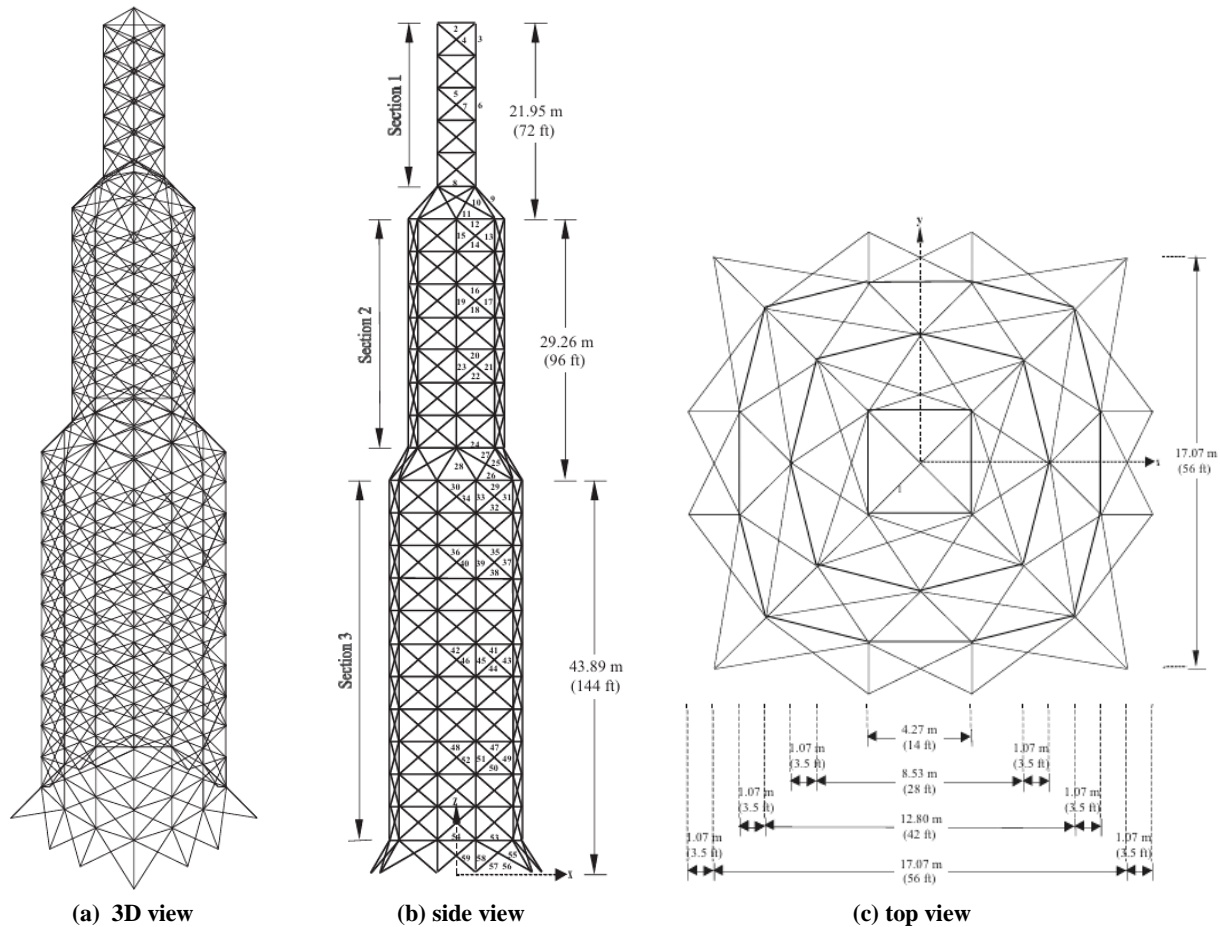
Schematic of the 942-bar tower truss, (a) 3D view, (b) side view, and (c) top view
